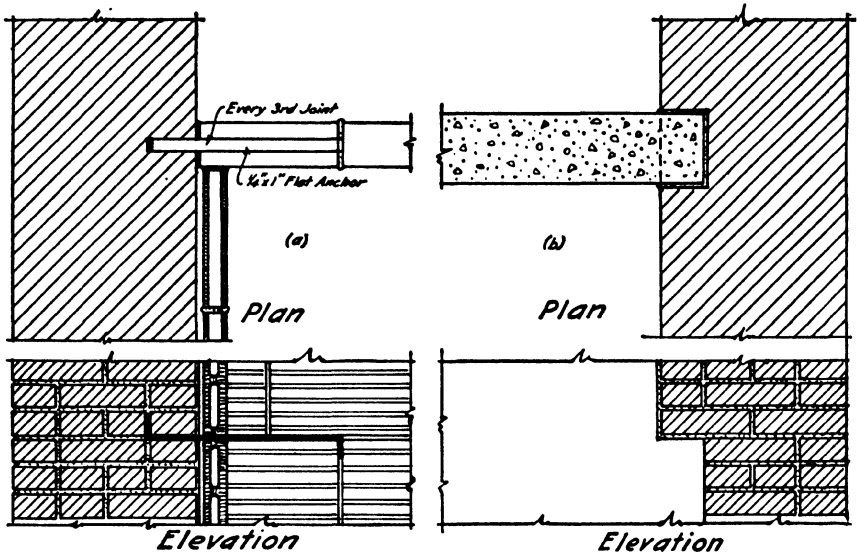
Furring Exterior Walls. (a) terra cotta partition and furring; (b) concrete partition.
